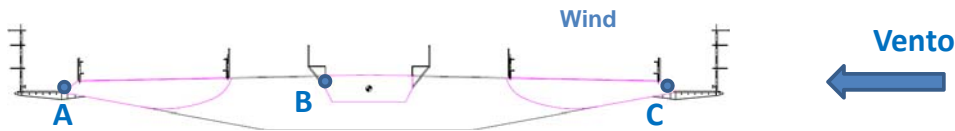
Considered point on the road and railway boxes of the Messina bridge deck section.
